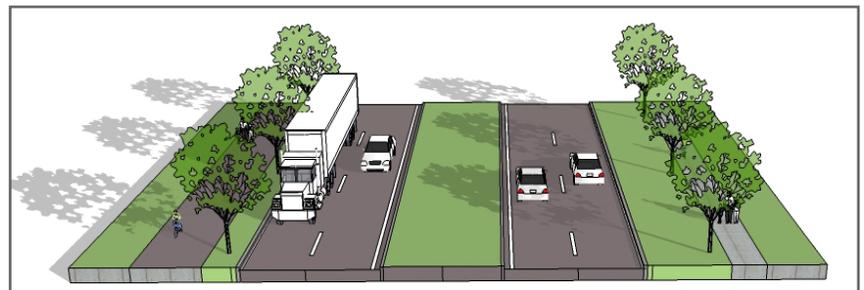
Sidewalk Setbacks and Tree Buffers
